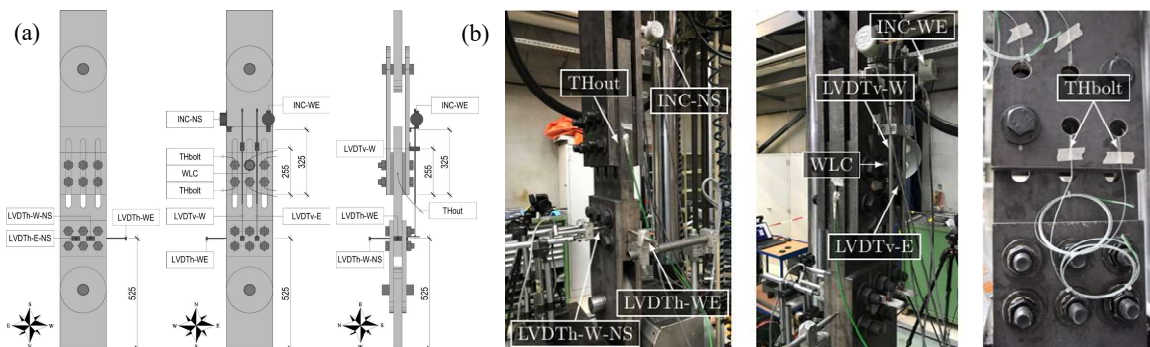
Instrumentation of the sliding friction damper: (a) drawing representation and sensor positions, (b) photos after the instrumentation installation on one of the test specimens
